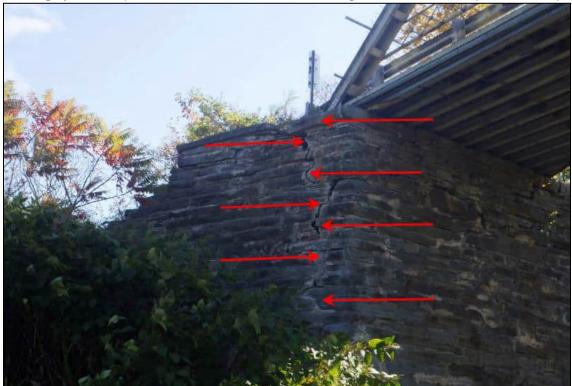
Looking Upstream at Existing Truss Bridge (September 2023).
